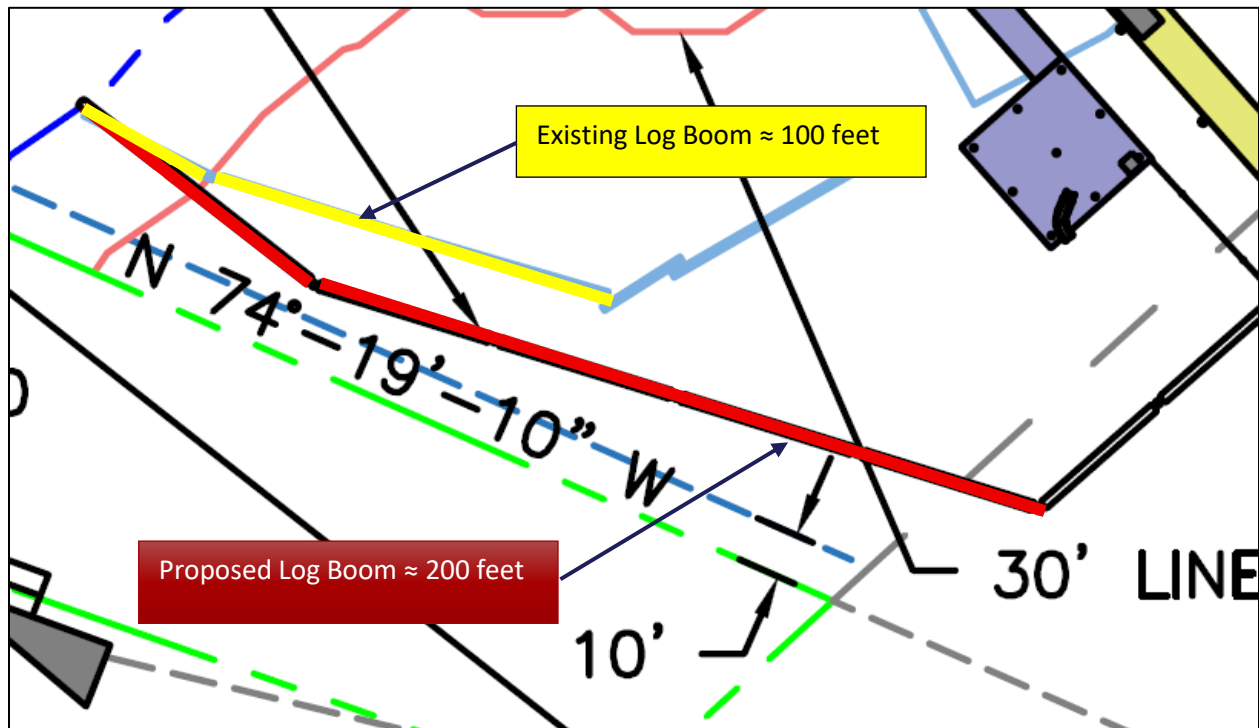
Layout of the existing and proposed log booms (Waterfront Construction Inc., 2025).
